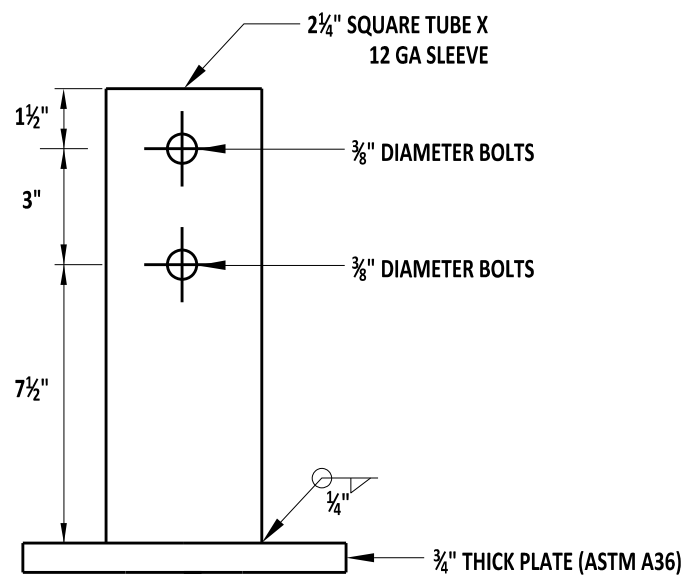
DETAIL 'A' - SIDE VIEW CONCRETE BARRIER
